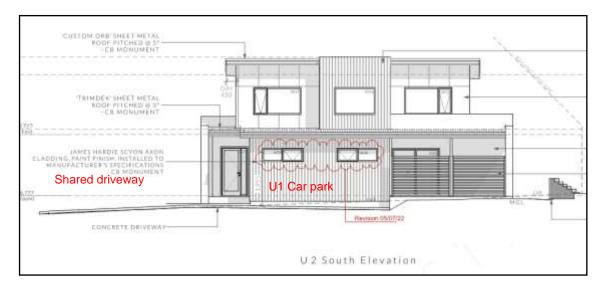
U2 South Elevation indicating W08, W09 adjacent to U1 car park
